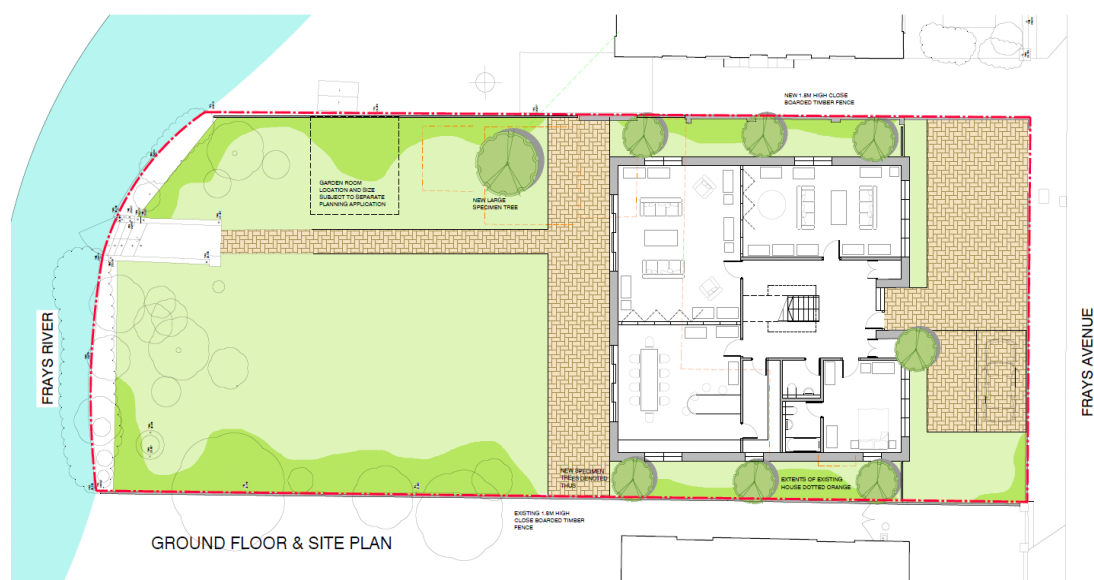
Extract of site layout plan showing how the position/layout of the replacement dwelling will harmonise with neighbouring properties to the north and south.
